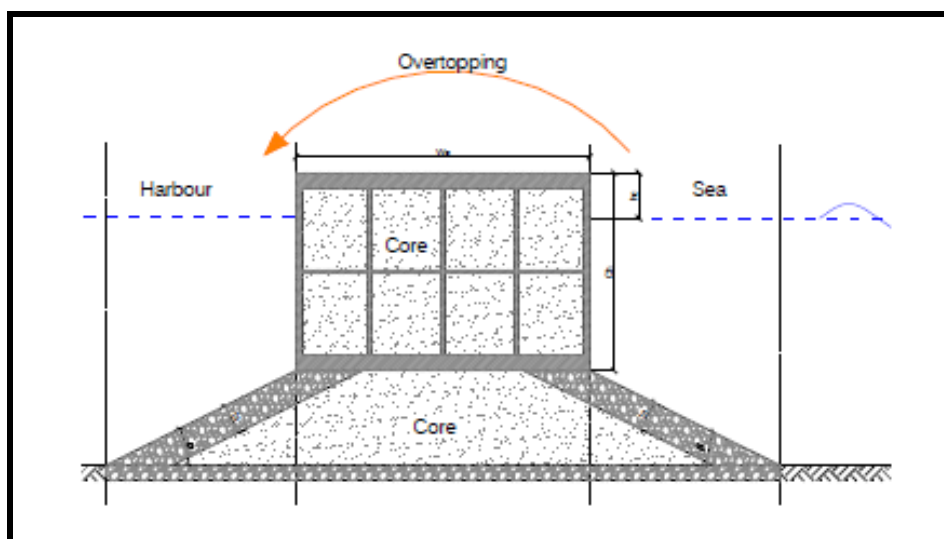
Conventional caisson breakwater with vertical front (Fousert, 2006)
